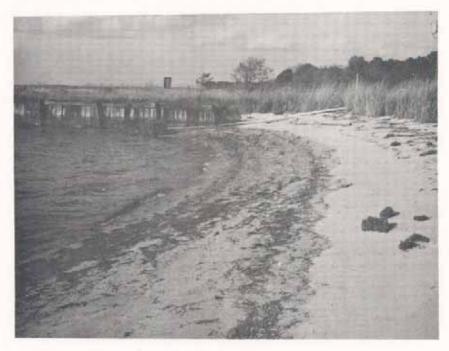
A. VIMS Spur Site, looking north at the structure next to wooden groin.
